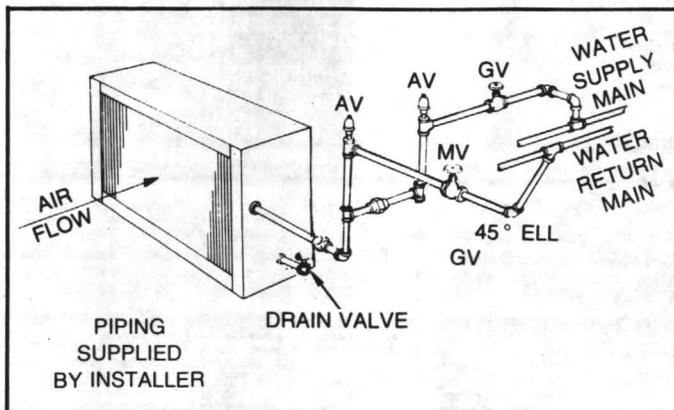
Typical Piping for Type W, Two-Row Water Coil
